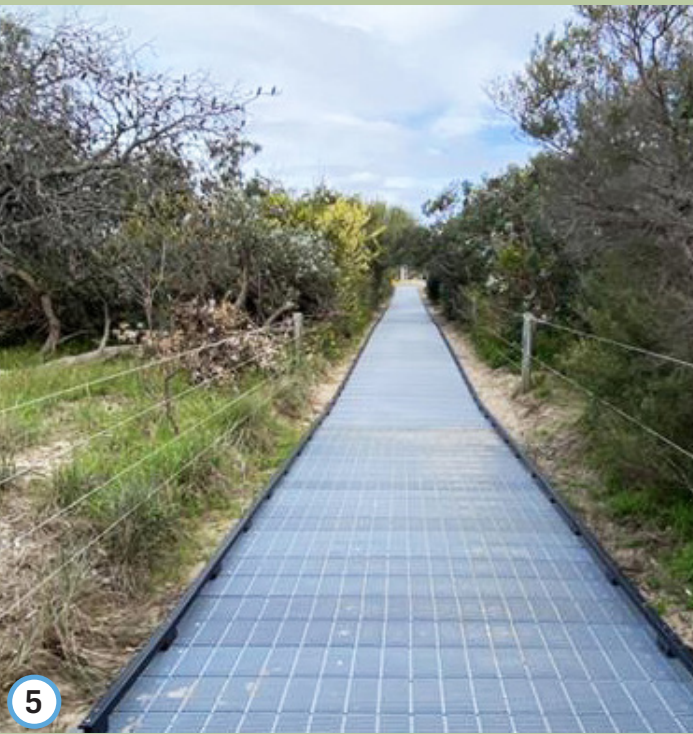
Raised boardwalk to minimise foot traffic and controlled access
